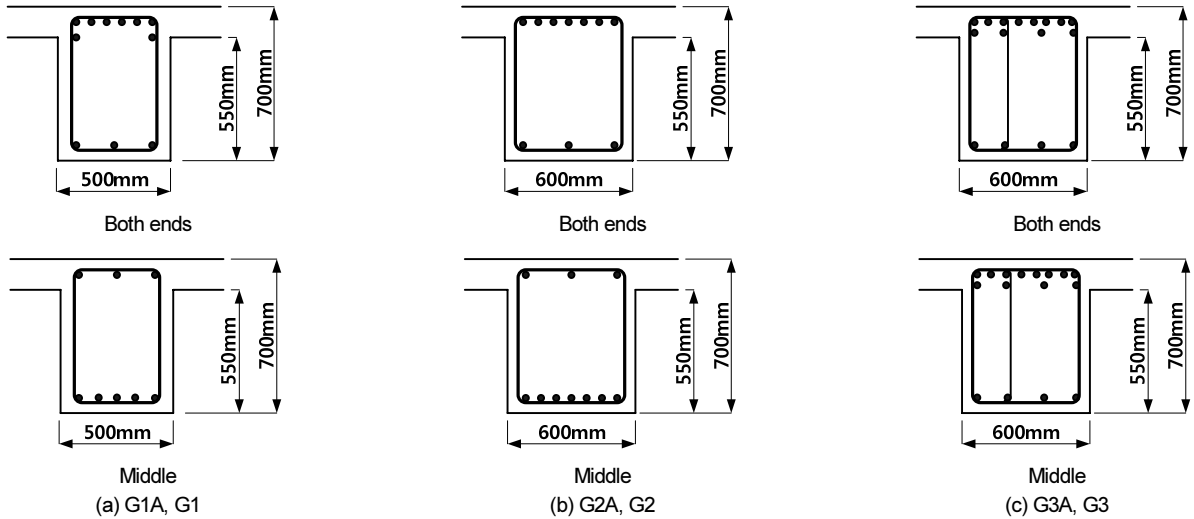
Dimension and reinforcement arrangement of beam cross sections
